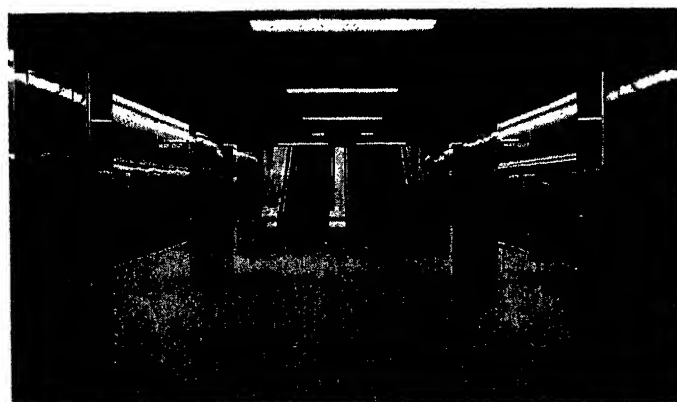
Eglinton Terminal. Platform level showing terrazzo flooring, glass-faced masonry, acoustic ceiling, tubular station lighting, etc. Center platforms are used at terminals only
